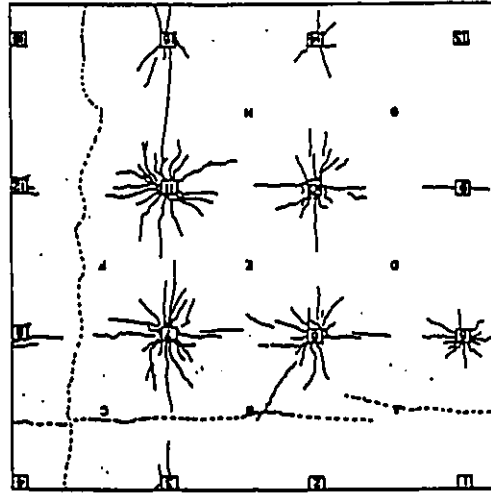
Crack pattern on Burns's test slab immediately before failure (1977)
